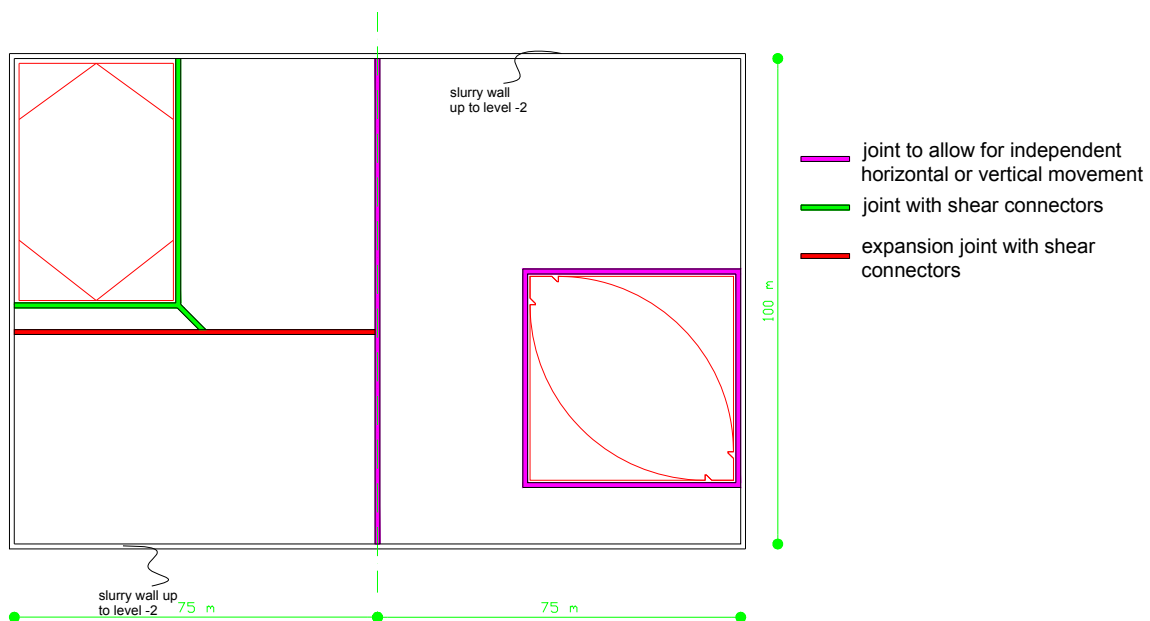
Basement connectivity Torre Espacio and Torre de Cristal
